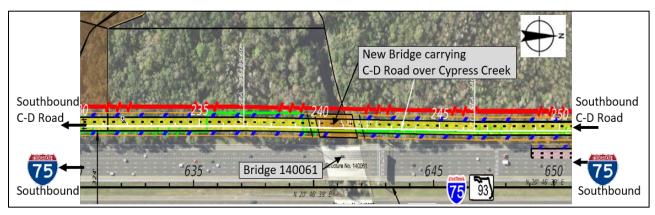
Preferred Alternative—New C-D Road Bridge over Cypress Creek (Figure 1-4 is not to scale and compressed to fit on page)
